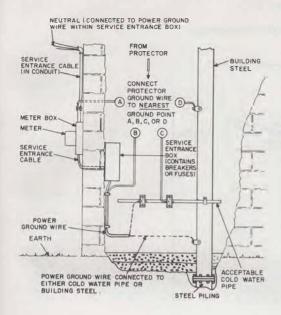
Acceptable Water System or Building Ground (Power Service Grounded to Cold Water Pipe or Building Steel)
